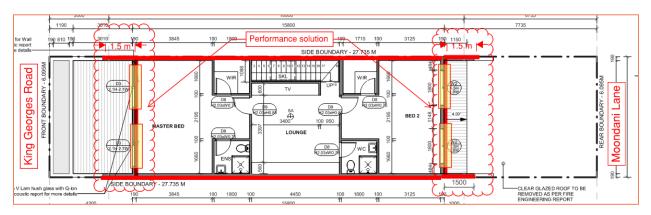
Indicative fire wall markup – Second floor (red solid line: fire wall; yellow shade: non-FRL openings). Note: fire wall and fire rating markup may be indicative, and the building shall meet NCC DtS and certifier's requirements for fire rating in the DtS areas
